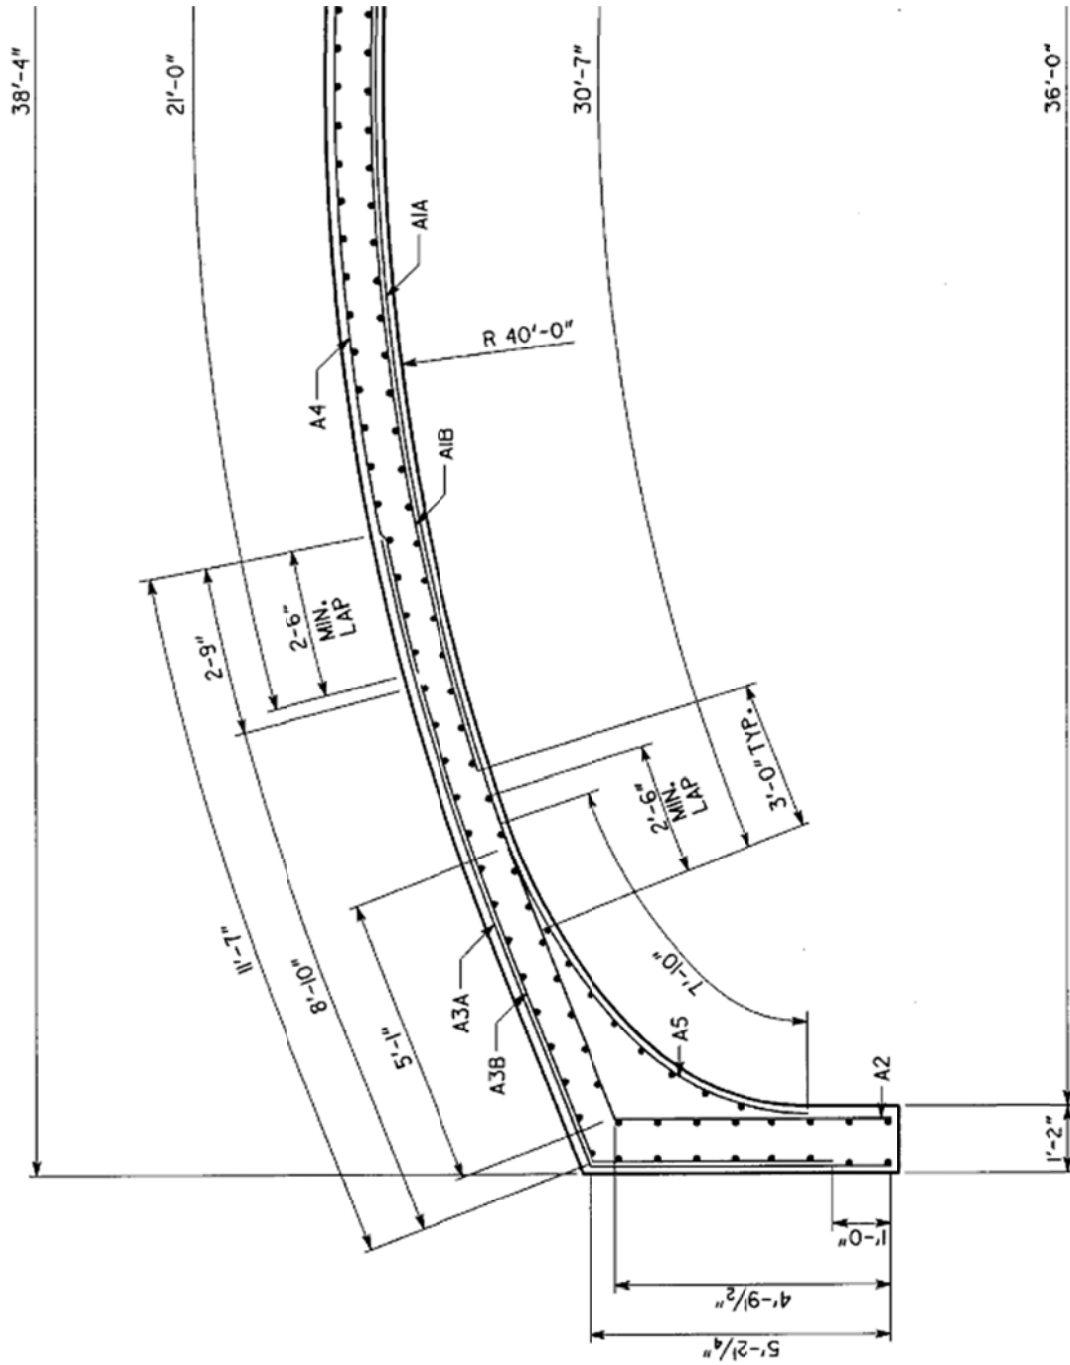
36 ft Bridge Unit Reinforcement Layout (FoleyArch 2011)
